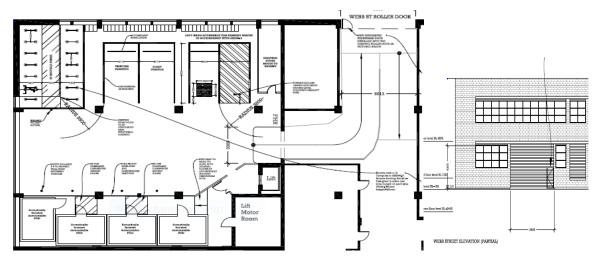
Section 57A advertised basement and new door insert to existing Webb Street roller door
